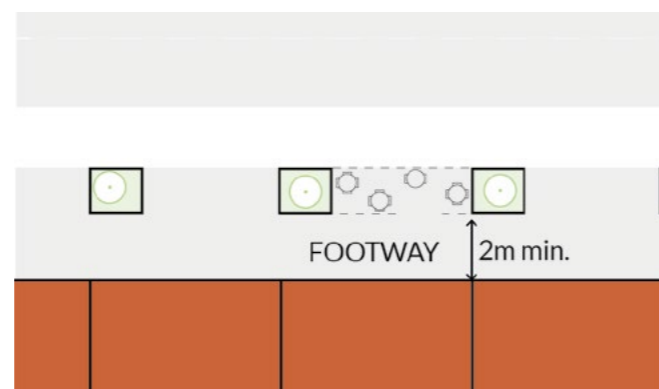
Features, such as planters, can be used to provide barriers to seating areas
